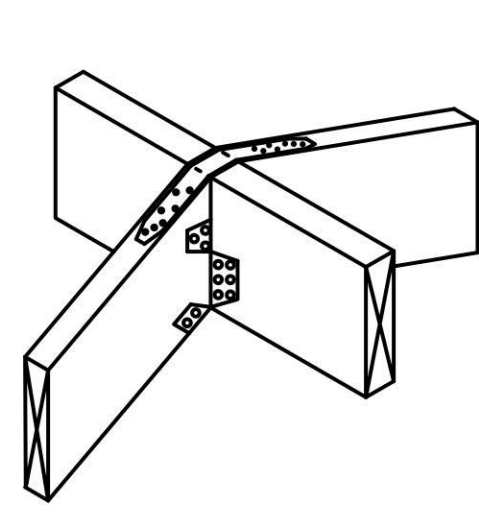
DETAIL FOR CHEEK WALLS FOR PORTICO PLATFORM
